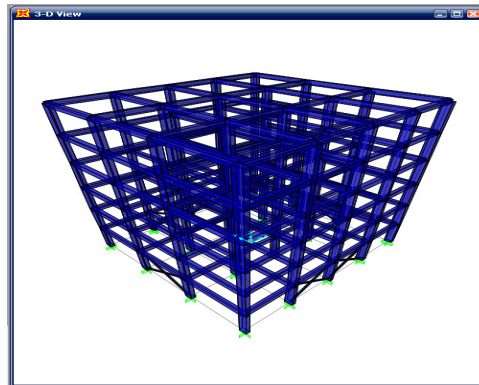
MODELLING OF UPDATED BUILDING CASE-2 STEEL BRACINGS [06]
